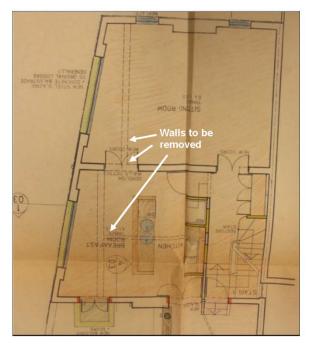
1989 first floor plan of the main wing. Internal walls were proposed to be removed with the existing recessed balconies. New windows and infill were also proposed to the associated wide openings.
